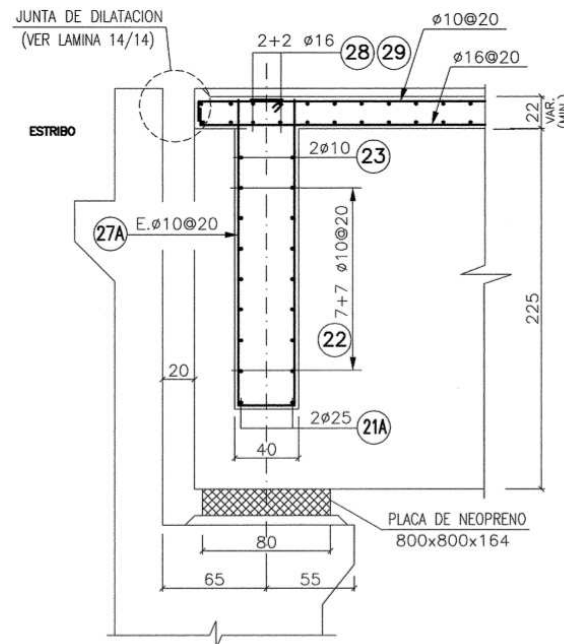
Construction detail for abutment to deck connection (courtesy Ministerio de Obras Públicas, Chile).
